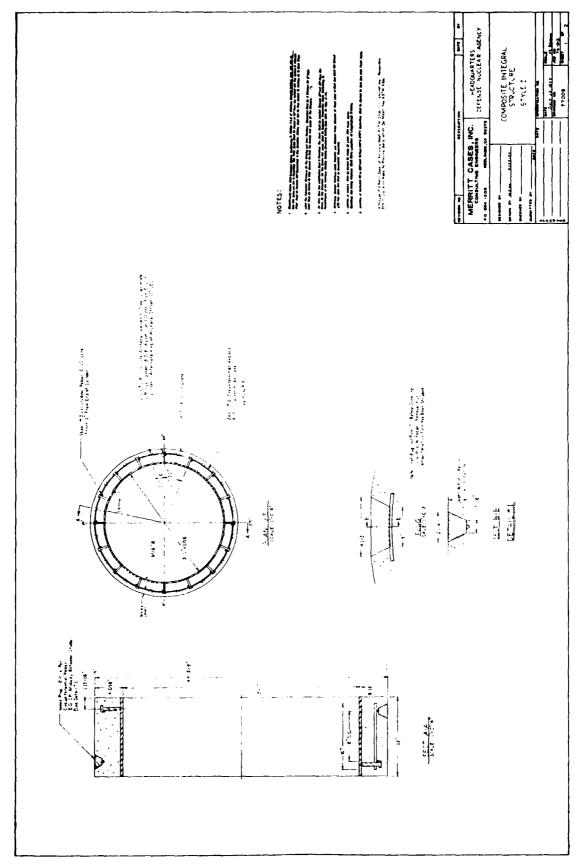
Details of MIGHTY EPIC C-Y-16 test specimen.
